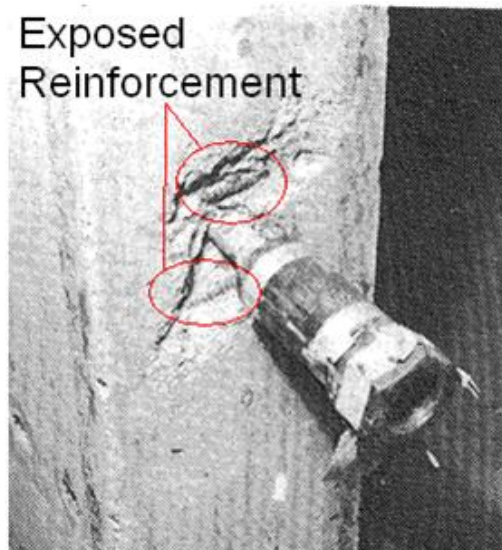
Specimen after breaking out of concrete cone (Viwathanatepa et al, 1979)
